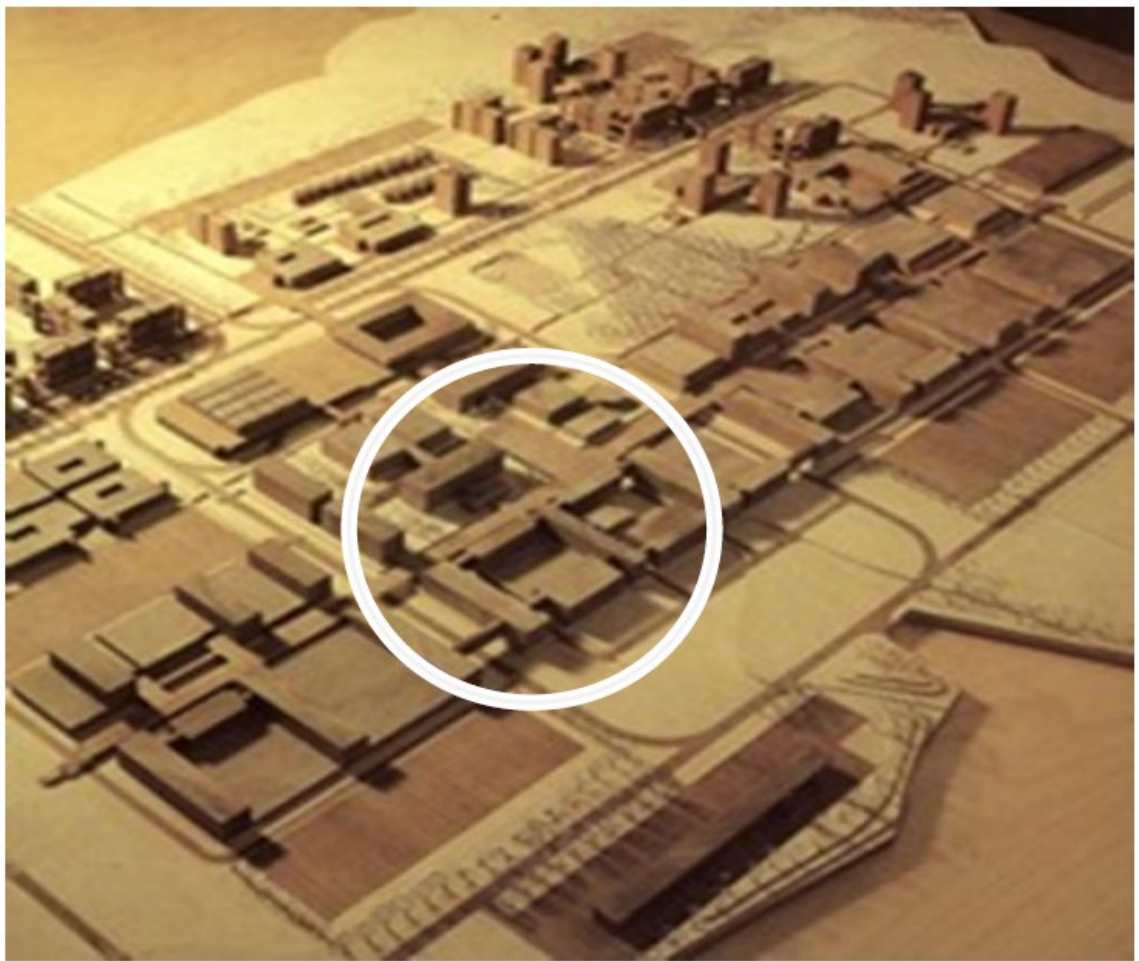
, Model of initial master plan that was required for planning reasons, to be consistent with previous approved plans, 1964, Yorke, Rosenberg and Mardall, Architects
